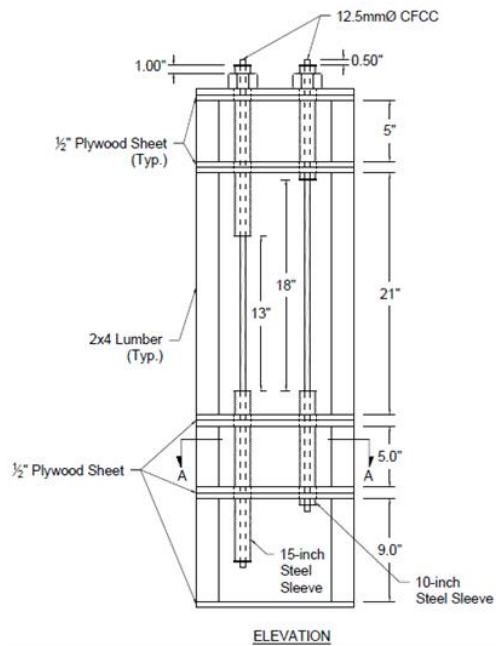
Wooden Frame for Casting and Curing of Grout within Steel Sleeve
